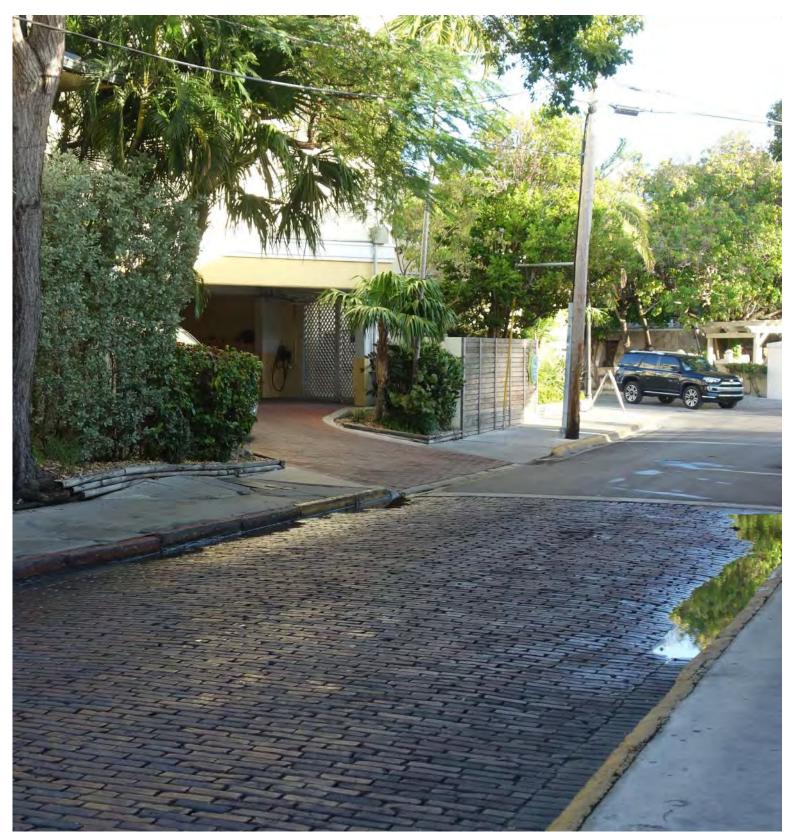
PHOTO TAKEN FROM WALL STREET, LOOKING DOWN TO DUVAL STREET. CORNER OF INTERSECTION IS OCEAN KEY RESORT PROPERTY BOUNDARY. EXISTING DRIVE AISLE ACCESS FROM WALL STREET.
